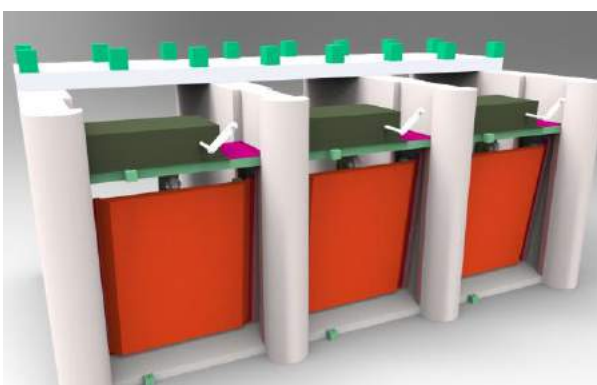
Testing of Fibre Reinforced Concrete gate in laboratory
